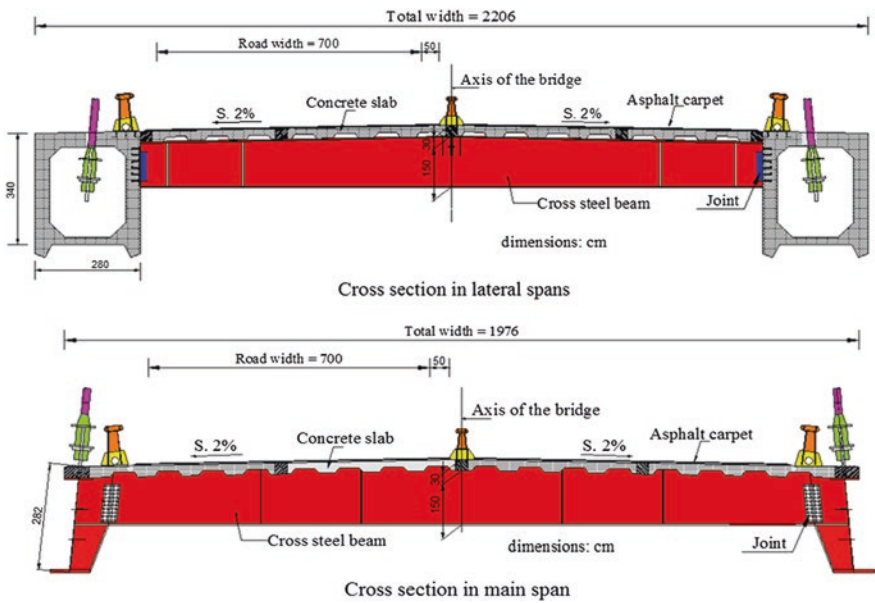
Cross sections of the superstructure, "Baluarte" bridge
